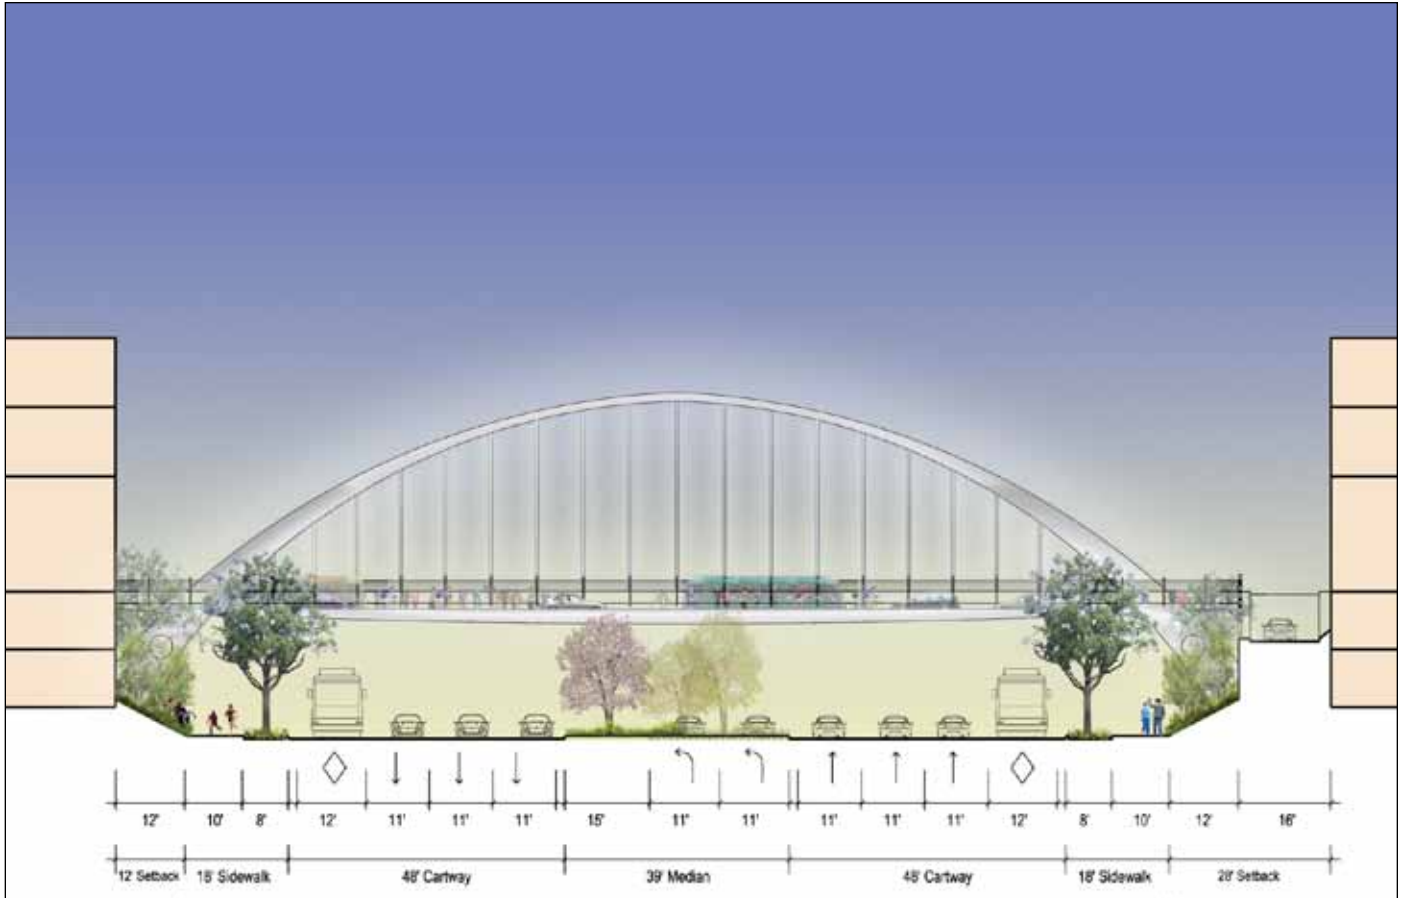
The proposed cross-section for Van Dorn Street provides for a substantial landscaped area along each side, with a multi-use trail for bicycles and pedestrians. Dedicated transit lanes are proposed to be added in the stretch of Duke Street from I-395 to Van Dorn Street.
